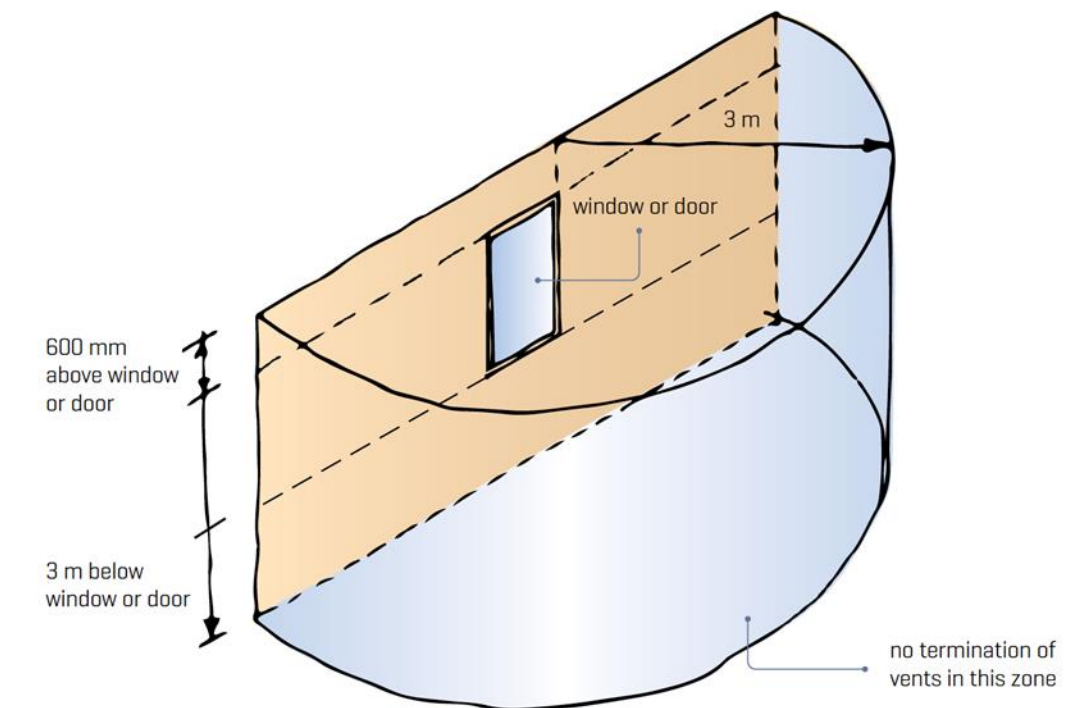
Termination point of vent 600 mm above and 3 m horizontally from a window, door or roof light.
